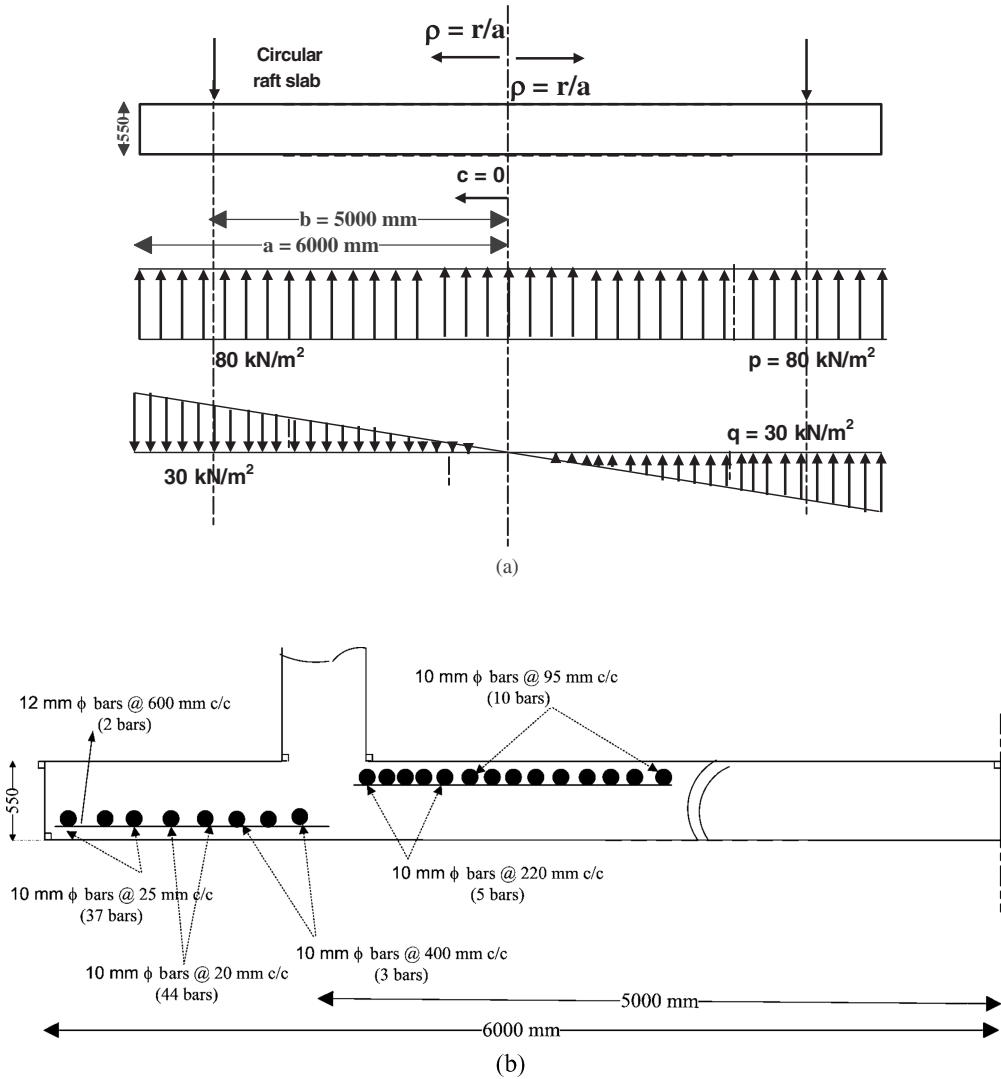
C.23 (a) Sectional elevation of circular raft and pressure distribution; and (b) reinforcement in raft slab (Example 12.9).
